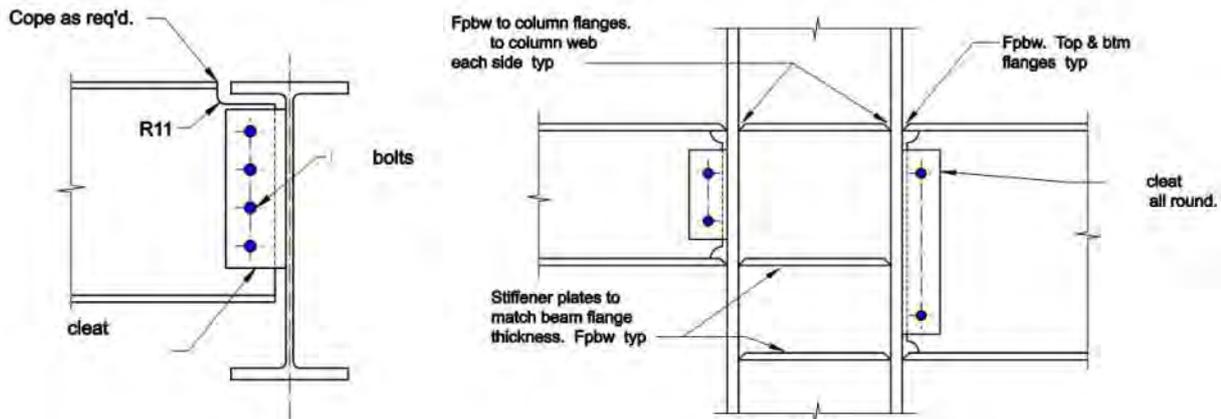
Examples of a simple pin-ended connection (left) and fixed connection (right)
